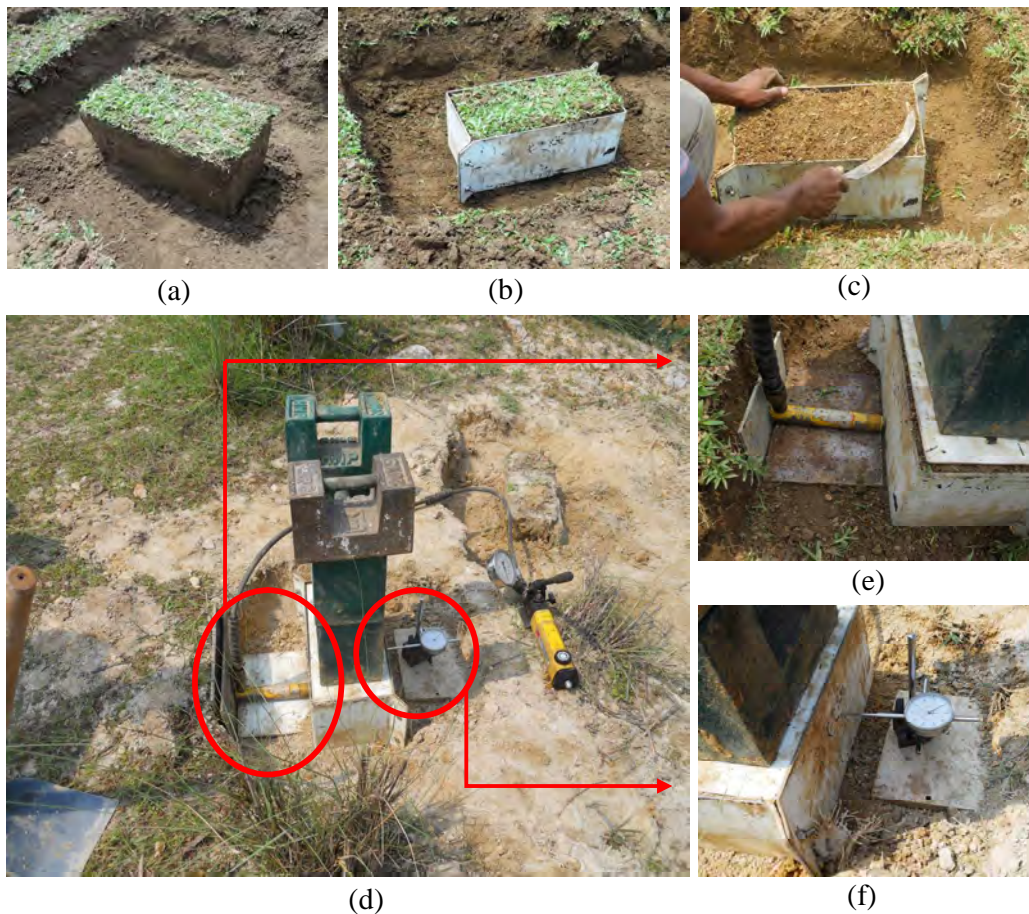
(a) Earth block, (b) block in metal box, (c) upper layer clumps are cutting down with a sickle, (d) test arrangement, (e) closer view of hydraulic jack placing and (f) closer view of LVDT attachment
